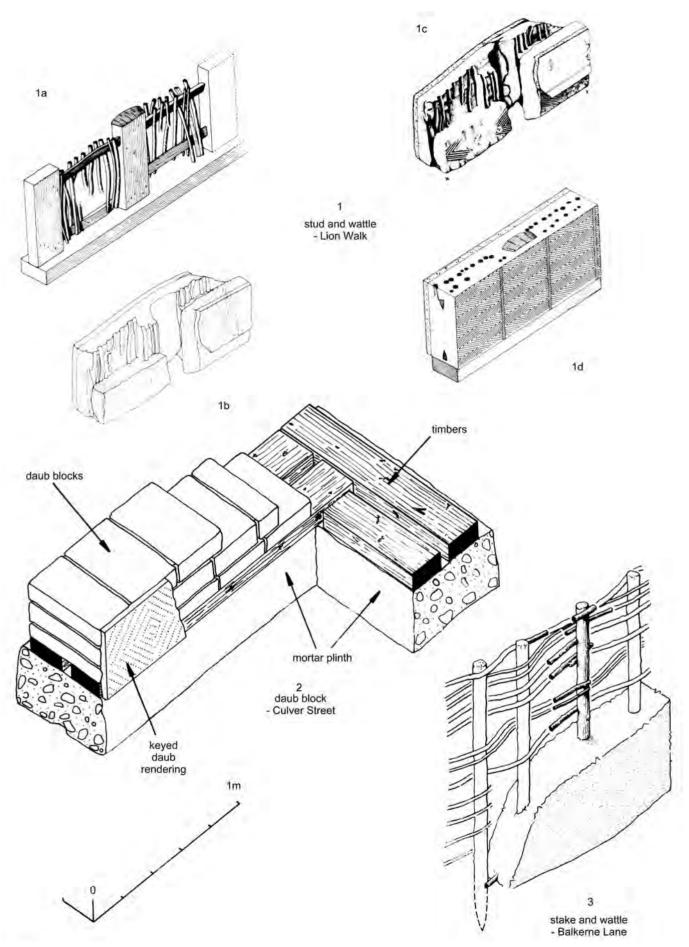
Construction methods for Roman walls, from Lion Walk, Culver Street and Balkerne Lane (Colchester Archaeological Trust).
